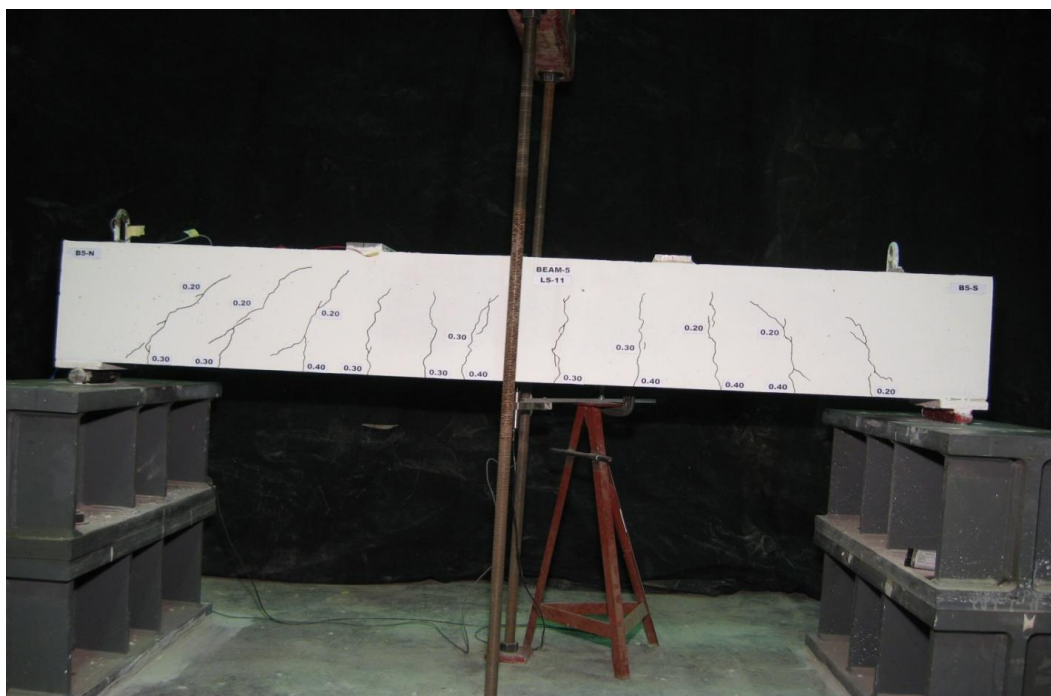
Cracking pattern for beam 5 at a load of 124.86 kN (B5-LS11)
